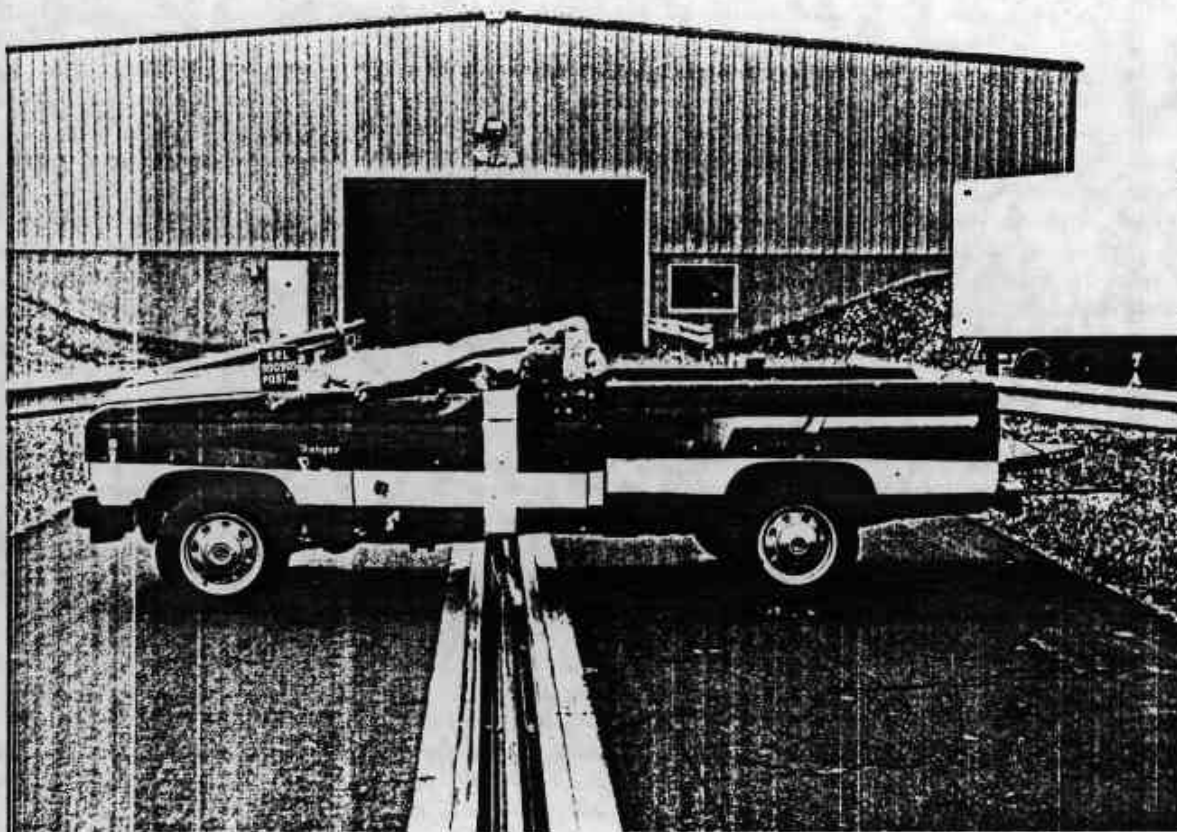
POST-TEST LEFT SIDE - VIEW 2
